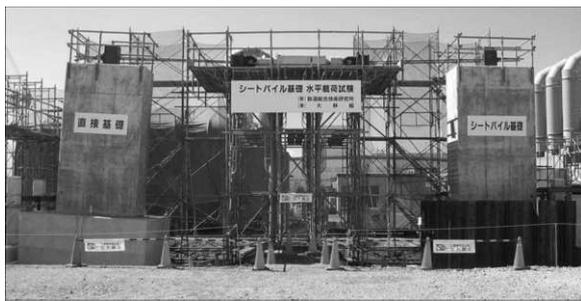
The full scale horizontal loading test on sheet pile foundation (after Nishioka et al., 2007).
